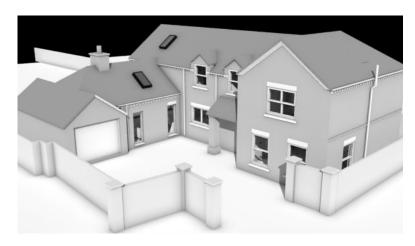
The proposed extension demonstrates a 'deferential transition of scale' between the two existing structures.
